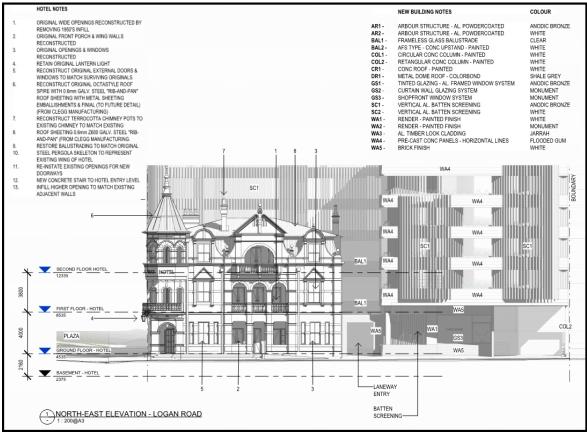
Extracts of Elevation restoration drawing and notes
